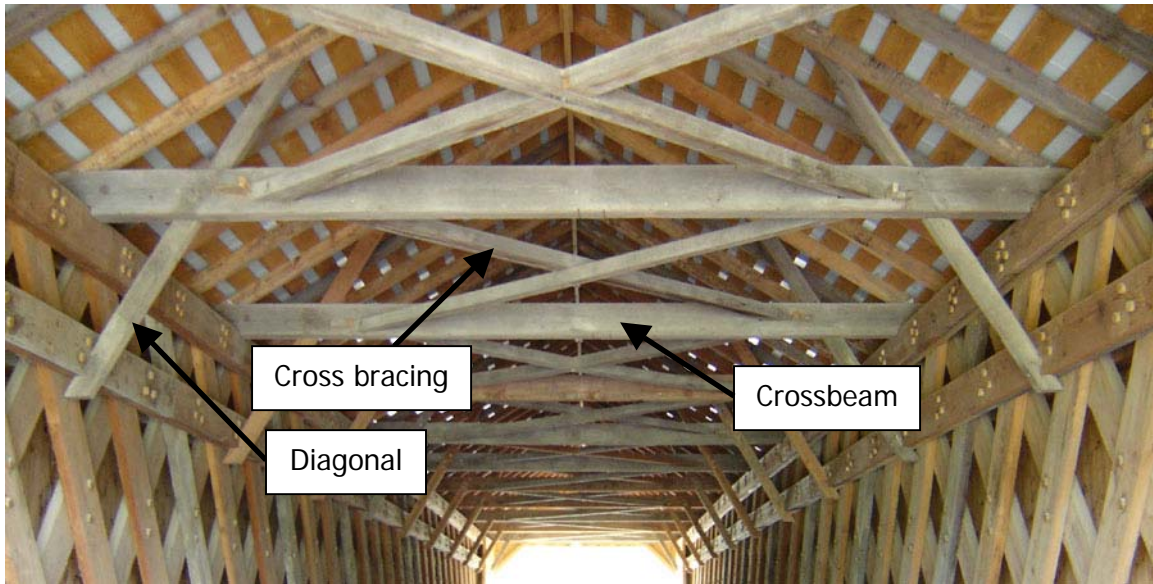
Roof framing of Town lattice truss bridge – Sanderson Bridge, Brandon, VT
